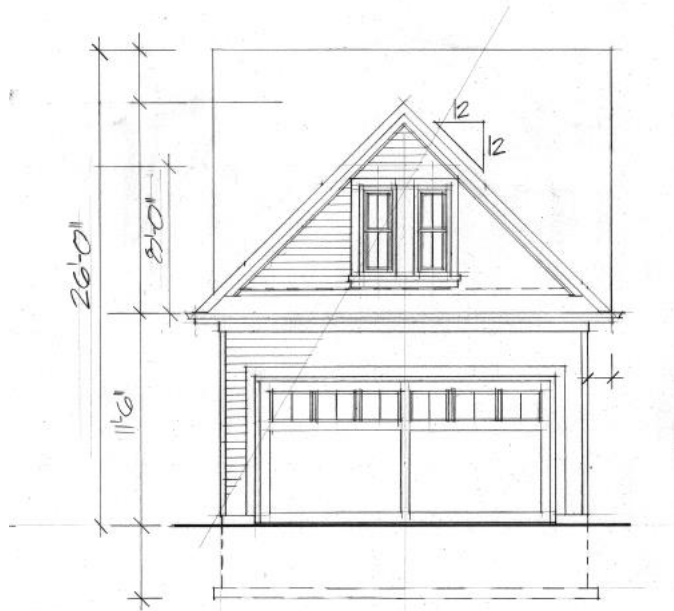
South elevation of the proposed rear detached garage, which will replace the existing unsympathetic temporary steel garage (Source: The Gregory Design Group).
